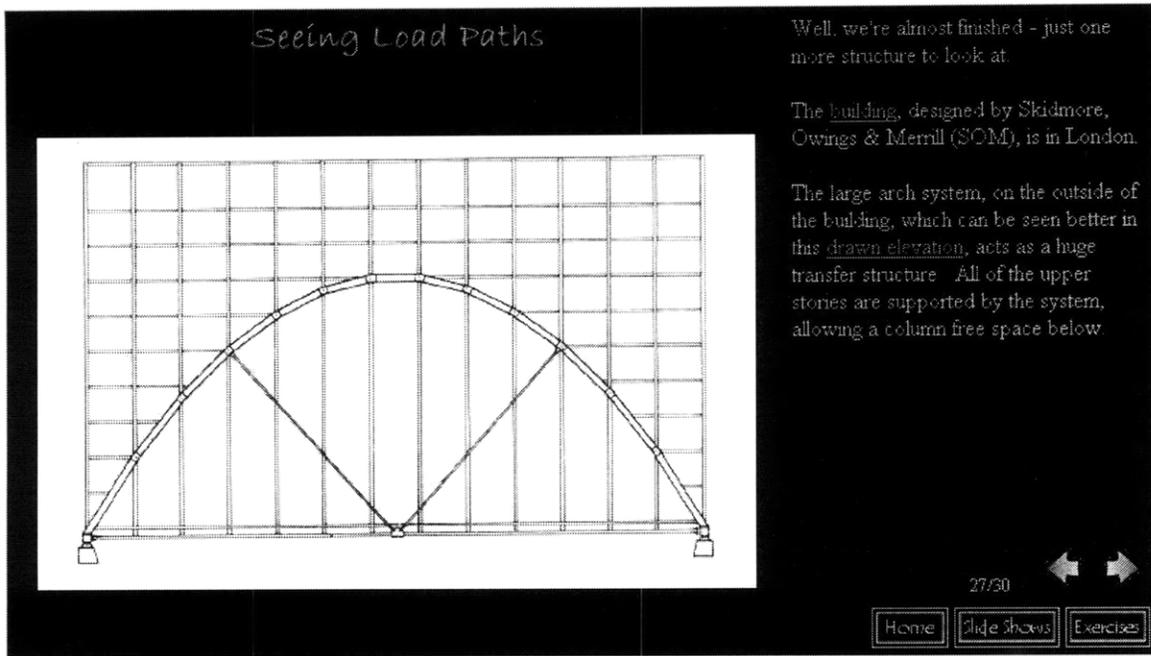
Screen 27 with a drawn elevation of the structure (image Ref [5])
